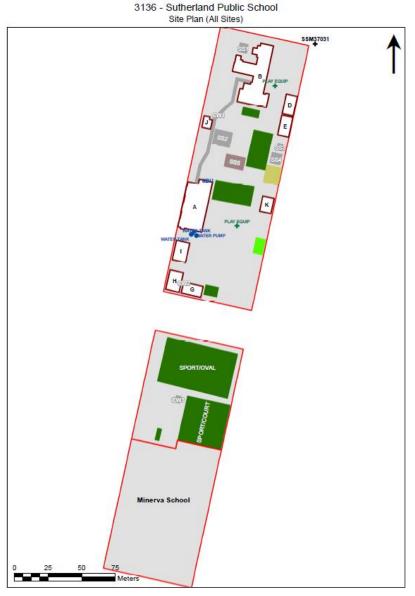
Site Plan for Sutherland Public School, showing location of the buildings.
